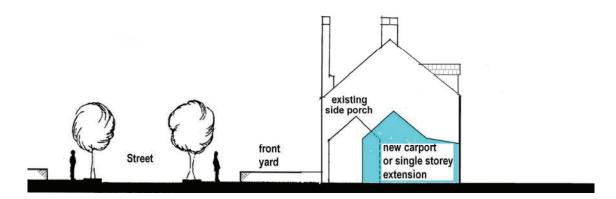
Side view – a new addition used as a carport, garage or dwelling space must be set behind an existing side porch. Roofs must be parallel with the slope of the existing roof or porch and use the same roofing material.
